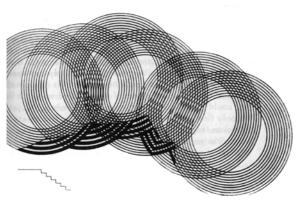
Utzon's proposal for the load bearing acoustic ceiling by undulating ply-wood beams using cylinder geometry
